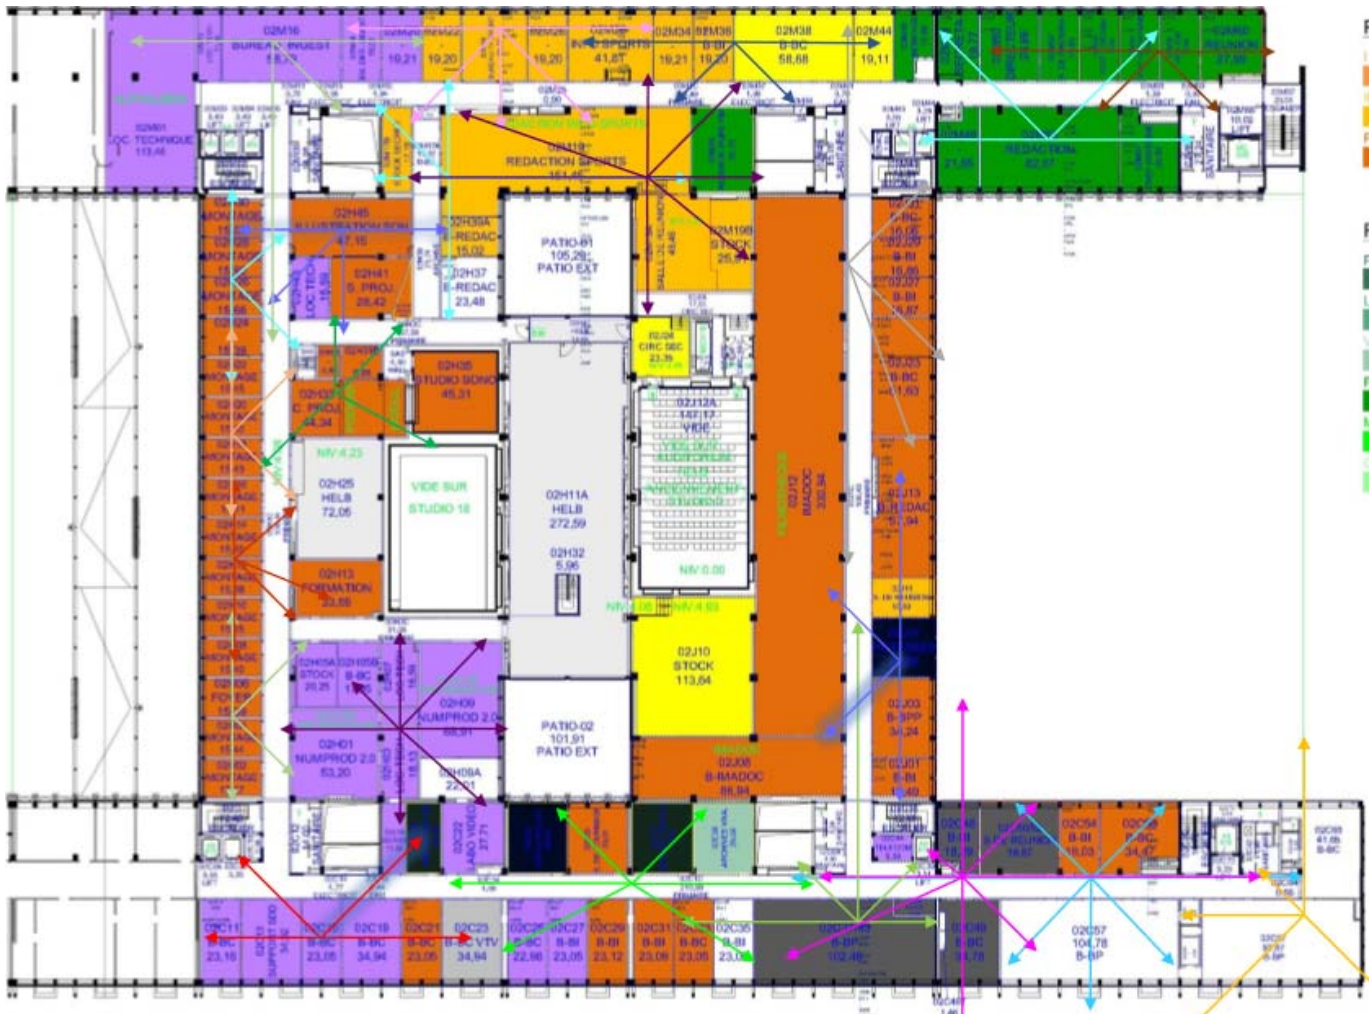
Design at 2.4 GHz for Floor 2 in Building PUVQ
